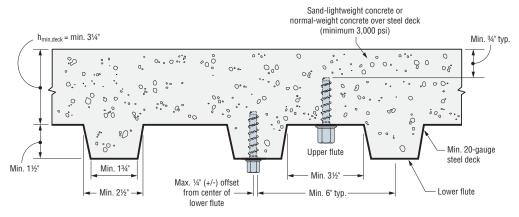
THDB25158RH and THDB37158RH Installation in Concrete over Metal Deck
